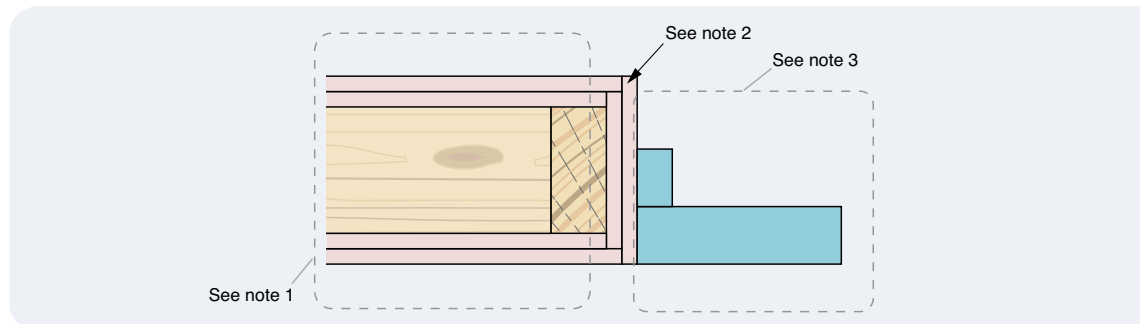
Access panel in a fire-protected timber-framed wall.
